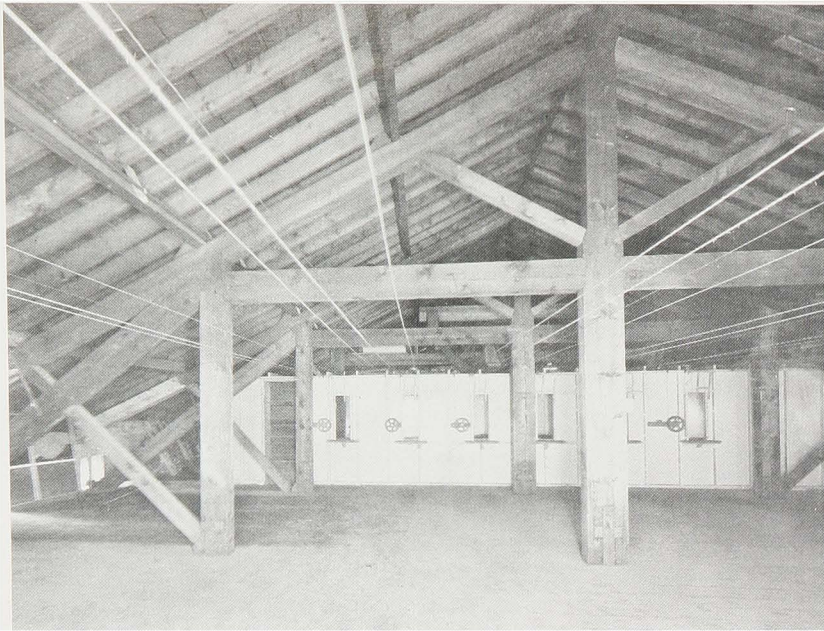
Roof trusses in the attic of the Clock Tower Building.
